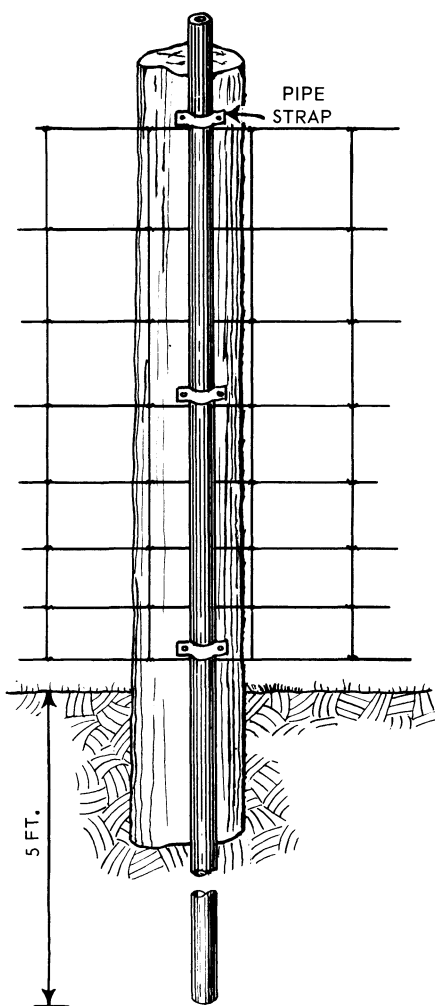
Wire fence grounded by driving a steel pipe into the ground.
